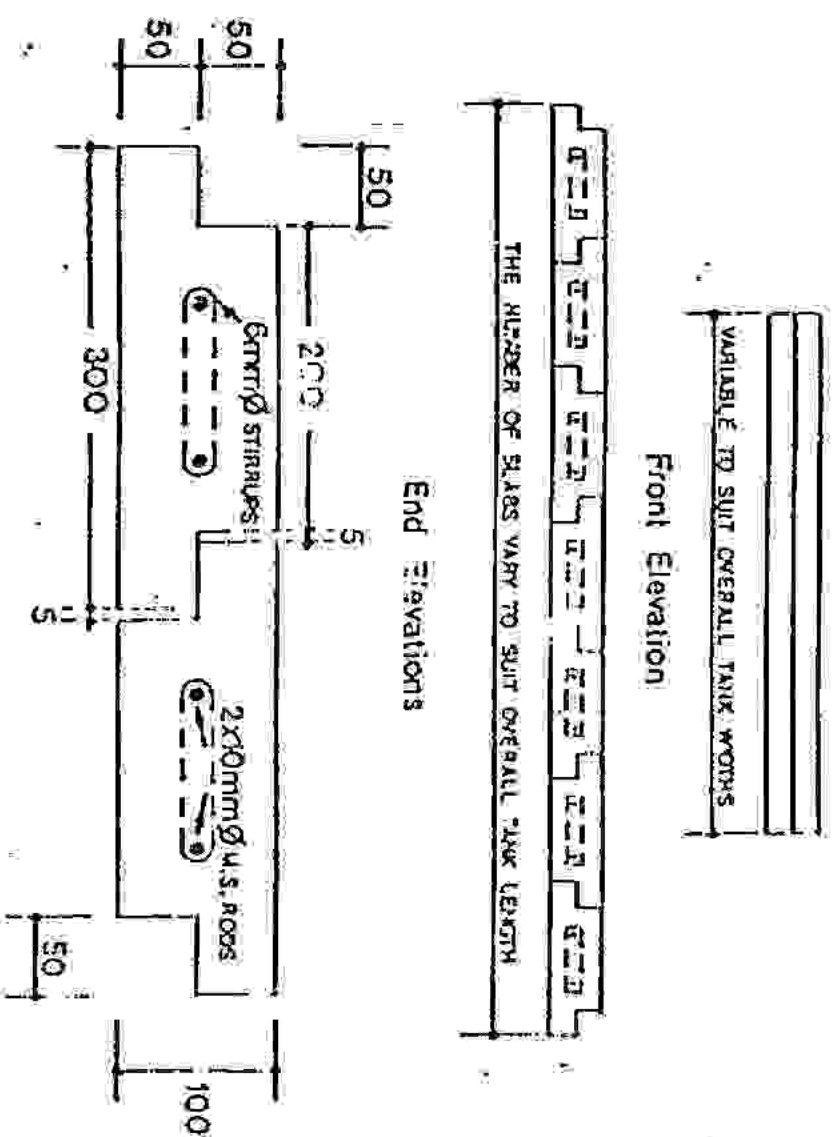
DETAILS OF REINFORCED CONCRETE ROOF SLABS
